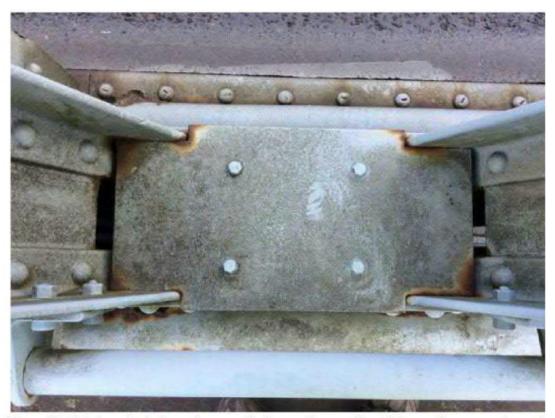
Finishes: deck elements - monitor to small areas of paint loss, minor corrosion and rust staining throughout the centre span truss members, particularly the bolts, rivets and plate ends. east side 4m north of south tower
